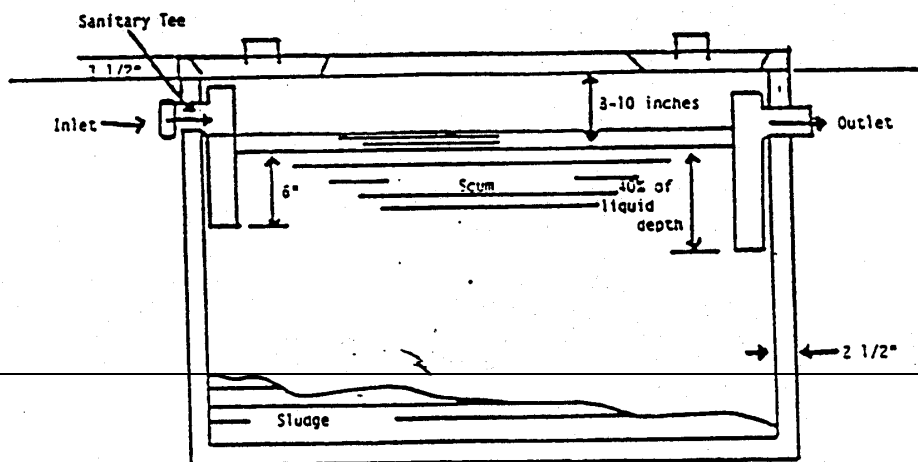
TYPICAL MANHOLE CONSTRUCTION FOR FIBERGLASS OR CONCRETE SEPTIC TANKS
